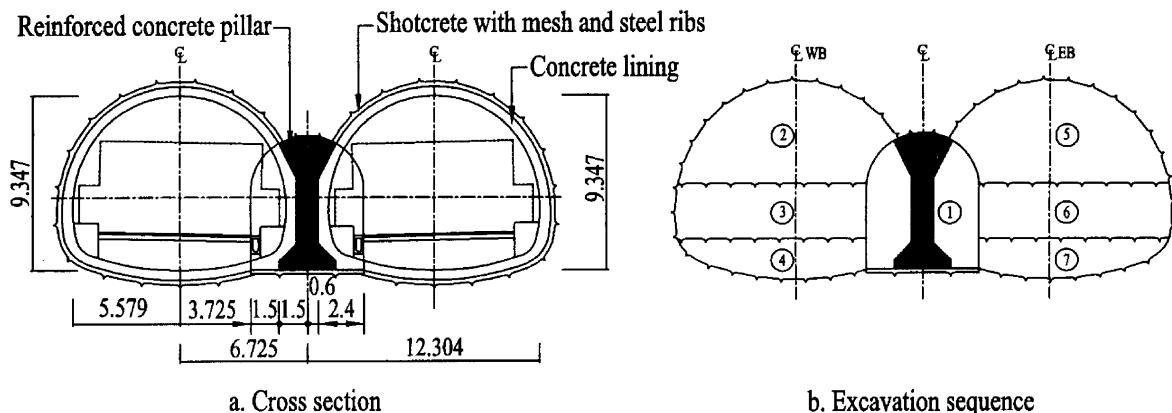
Cross-section and excavation sequence of Tsoumalai Tunnel.
